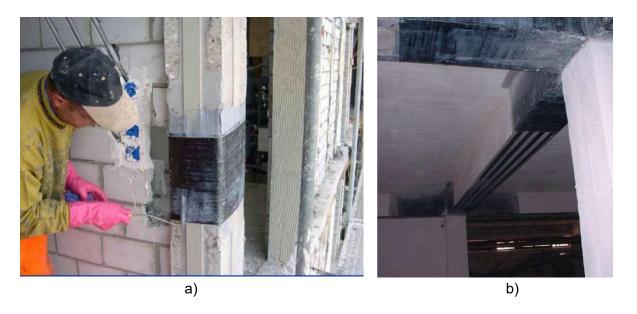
Applications of CFRP technology for strengthening existing RC structures in Serbia: a) wrapping of an existing non-ductile RC column in the "Tigar" plant, Pirot and b) strengthening of beams with deficient shear and flexural capacity, DIN, Niš (Zlatkov, 2014).
